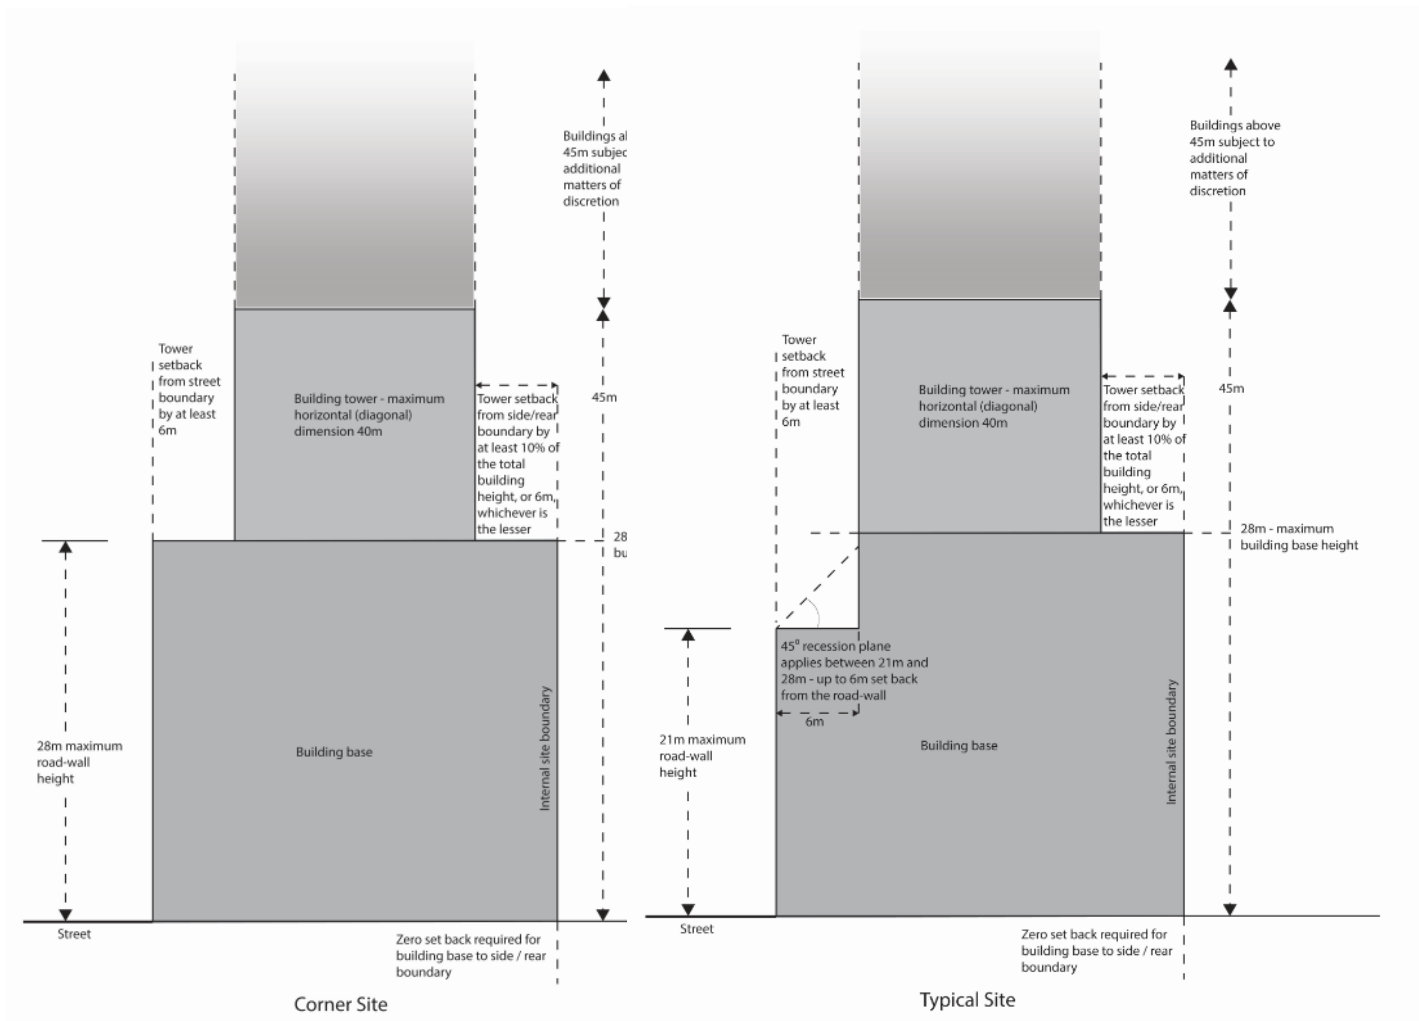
Images above showing the application of the building tower rules for both a corner site (left) and with a city block (right)
